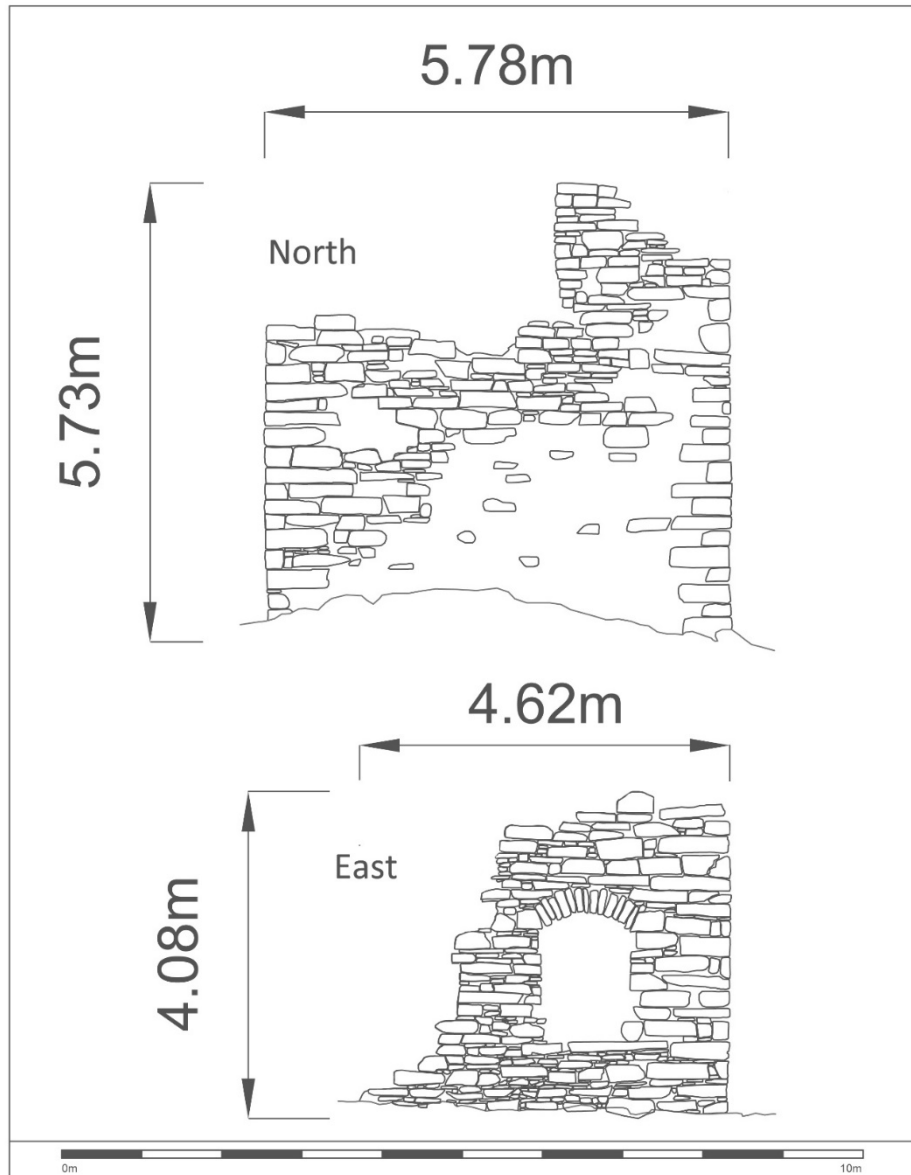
External elevations of the north and east walls of the signal tower at Horn Head Signal Station.
